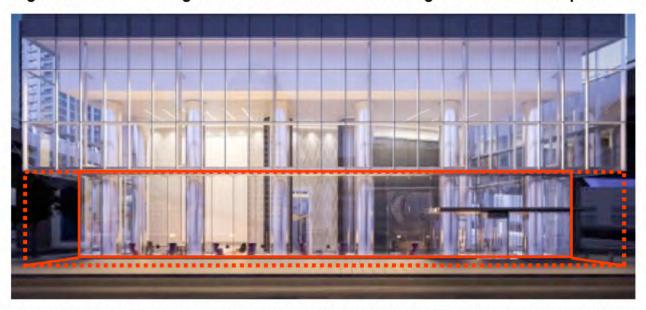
View Looking West from York Street Showing Exterior Streetscape Site
